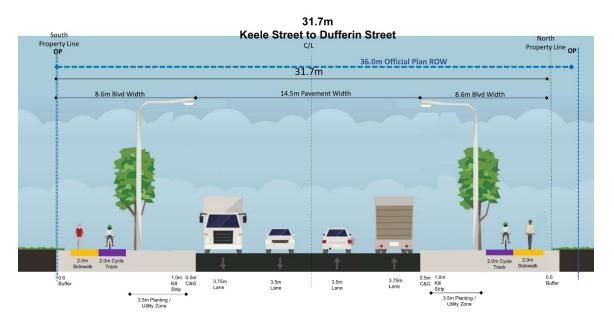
Typical Cross-Section - Kirby Road (Keele Street to Dufferin Street)
